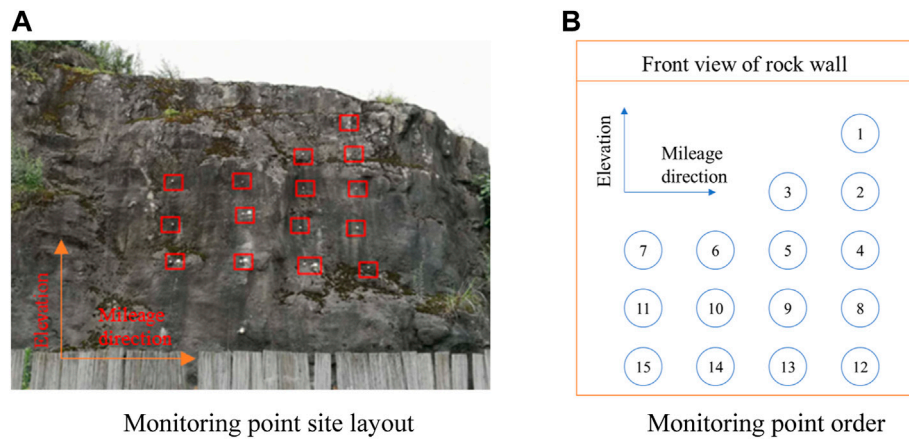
| Site layout and detail arrangement of 15 monitoring points.
